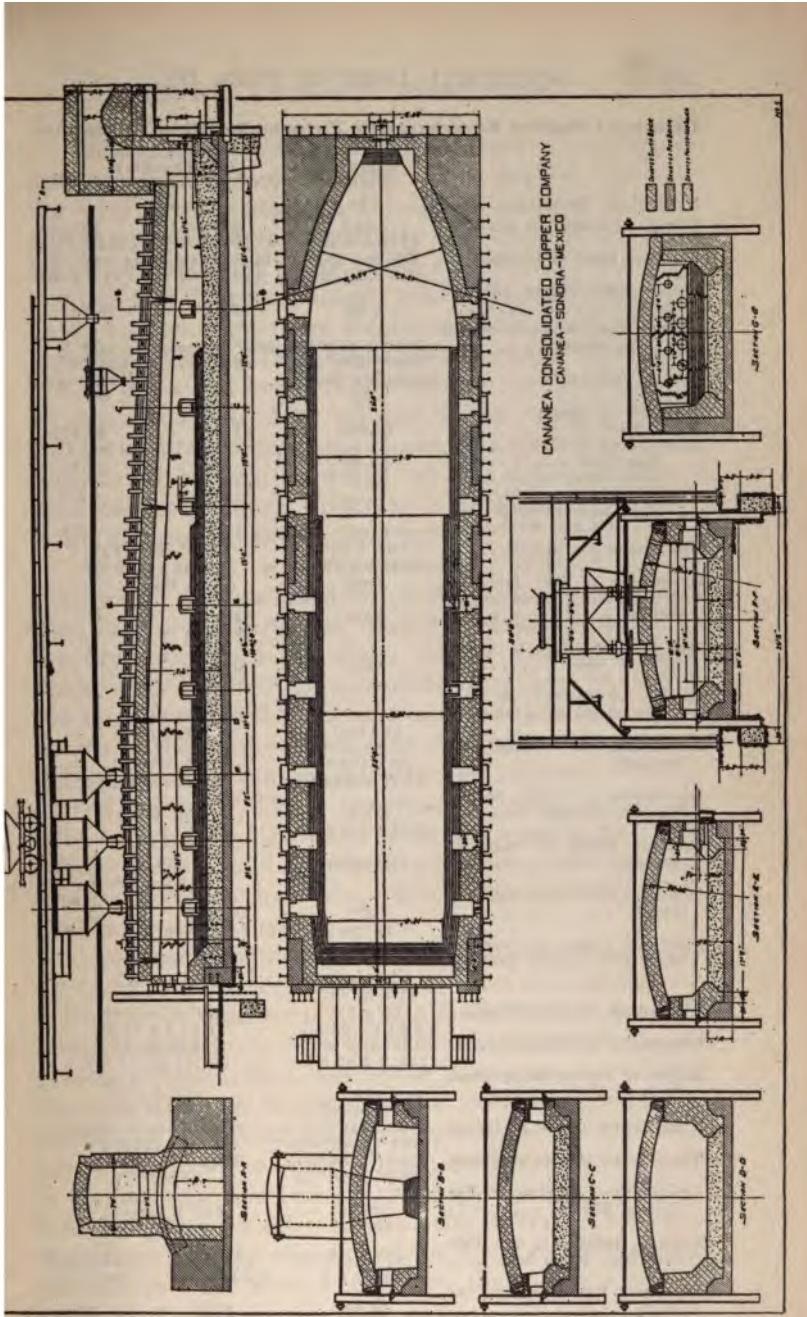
Plan and Section of Cananea Oil Fired Furnace.
